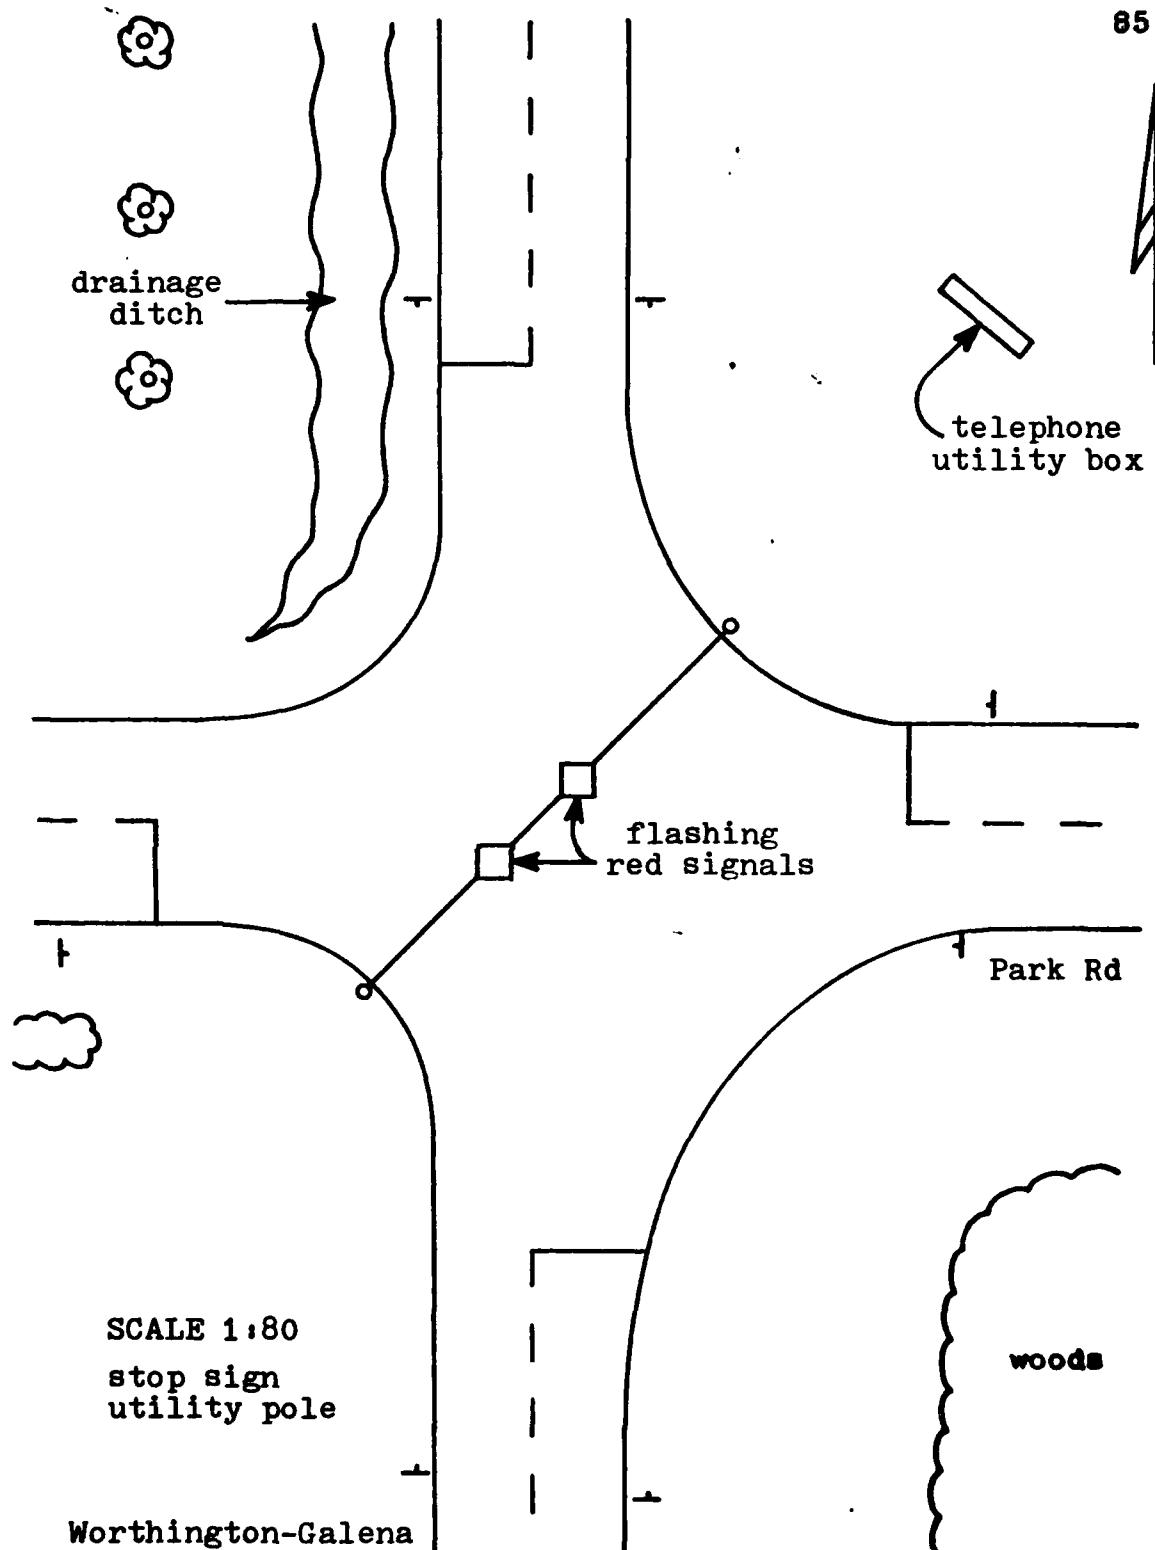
Intersection 1, Park Rd and Worthington-Galena Rd
